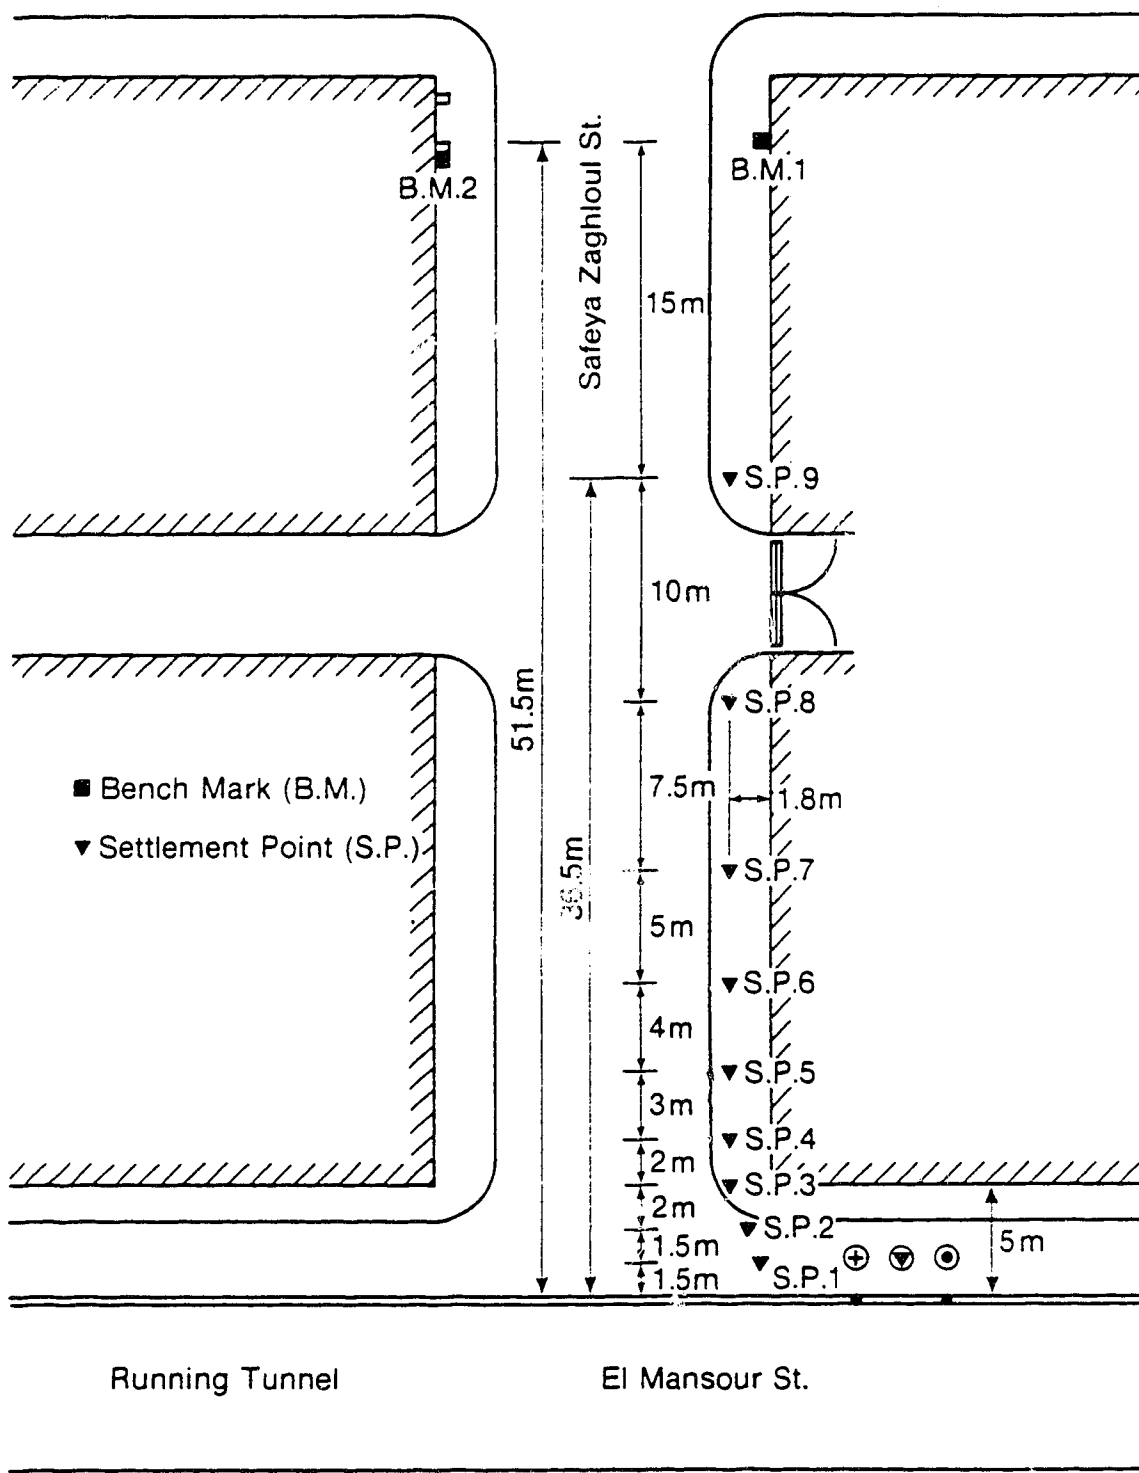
The Surface Settlement Point Distribution at the Tunnel Test Section
